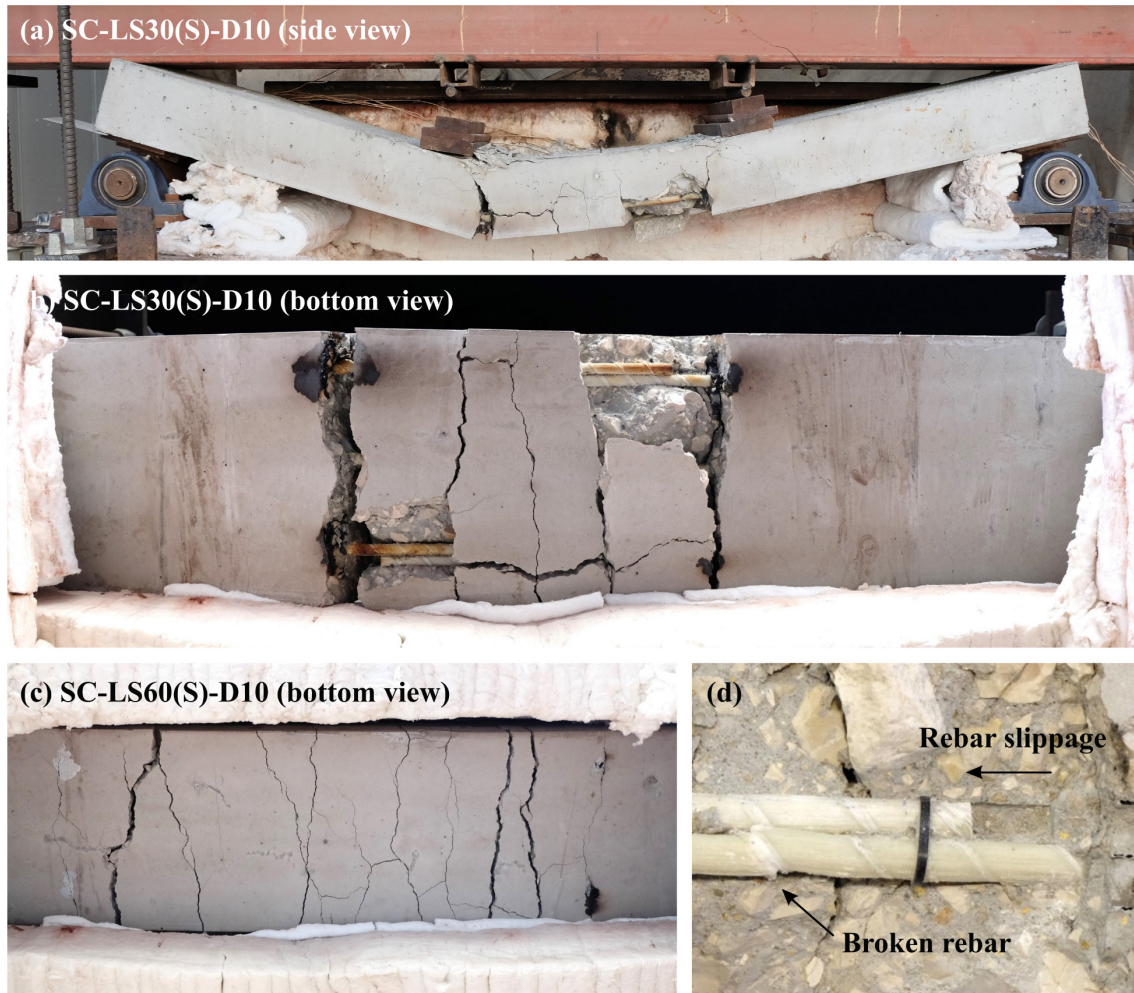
View of slab strips with lap-spliced reinforcement after the fire resistance tests: (a, b) SC-LS30(S)-D10, (c) SC-LS60(S)-D10, and (d) detail of broken rebar and rebar slippage on the lap splice.
